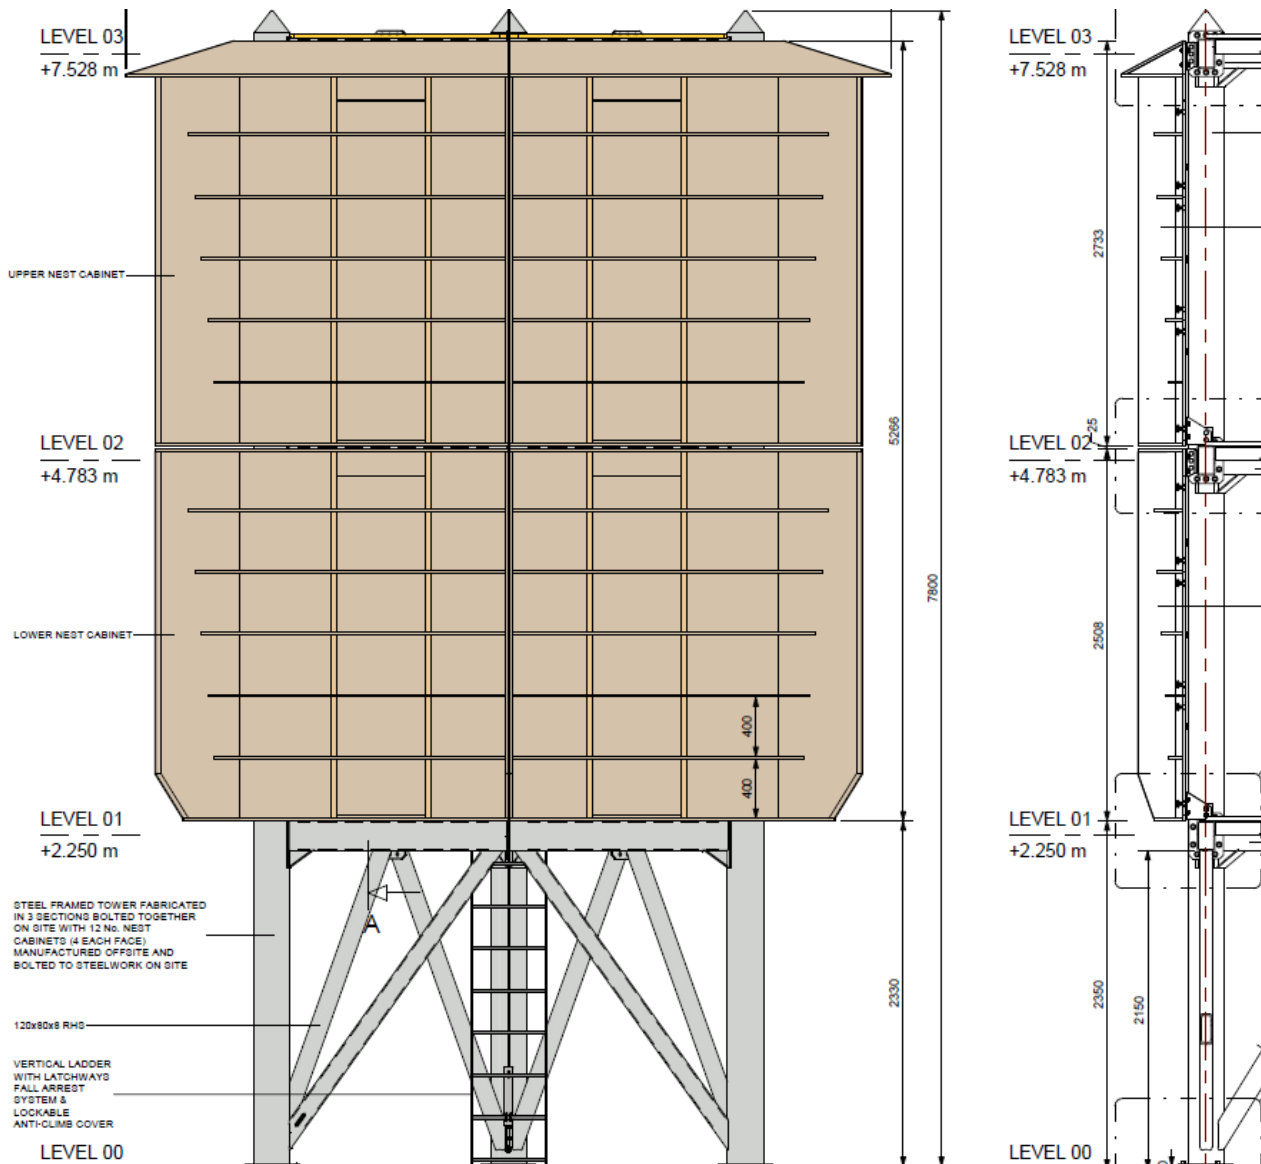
Nesting Cabinets Side View (Left) & Sectional View
